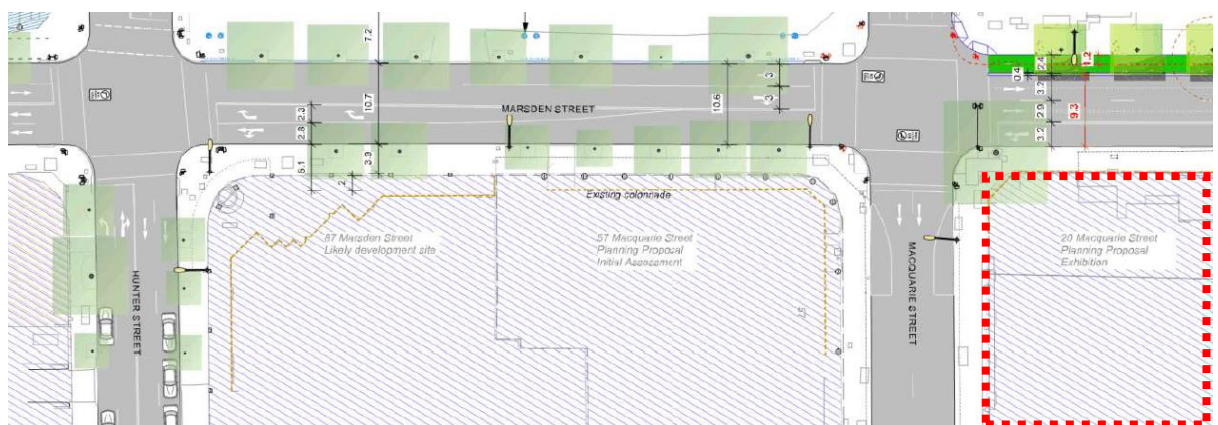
Marsden Street Cycleway Concept Design – opposite 20-22 Macquarie Street, Parramatta
